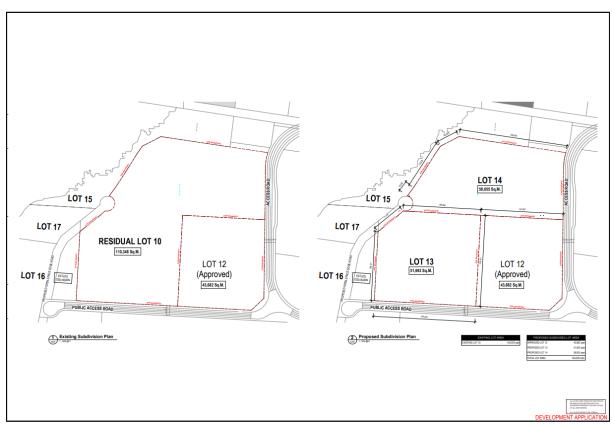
Subdivision Plan (Source: HLA Architects, 2023)
